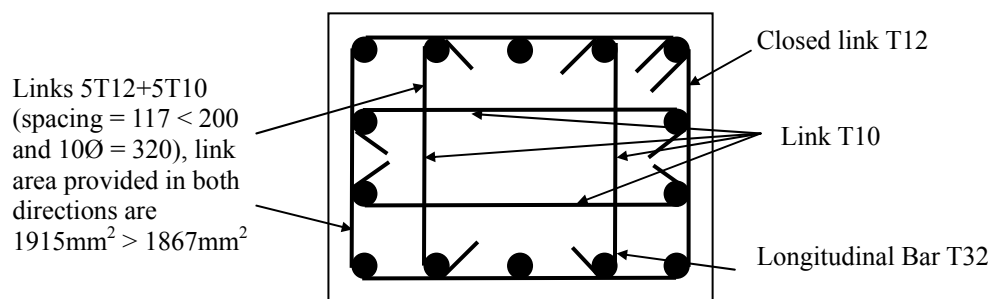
Required Horizontal Shear Links of Beam-Column Joint (Plan) for Design Worked Example 6.2 – Other details Omitted for Clarity
